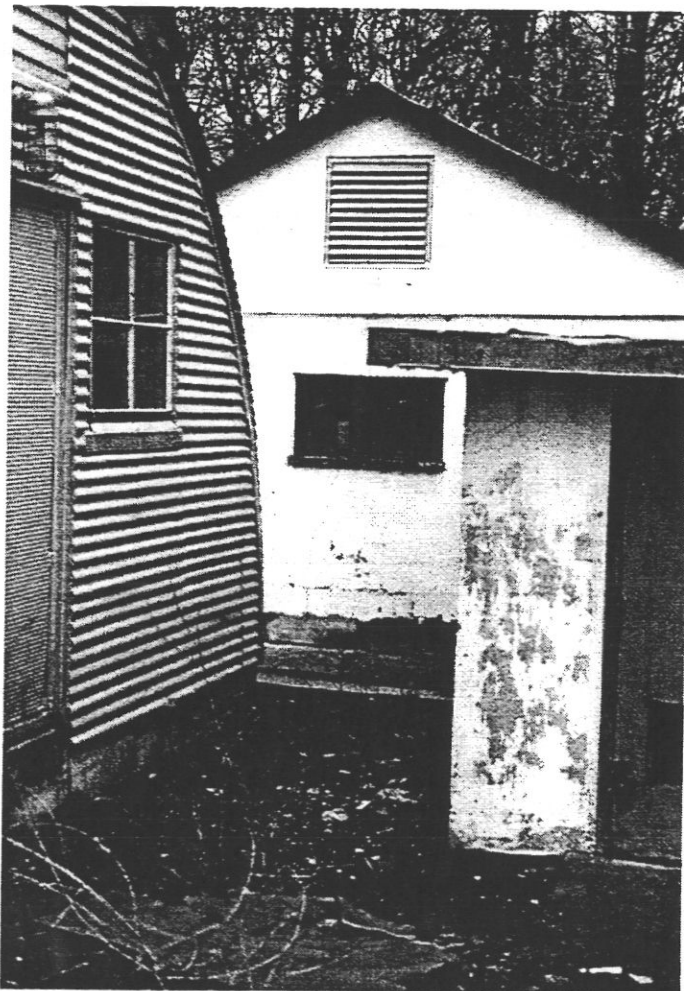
West facade of Building 146 with Buildings 174 and 219 in foreground.
